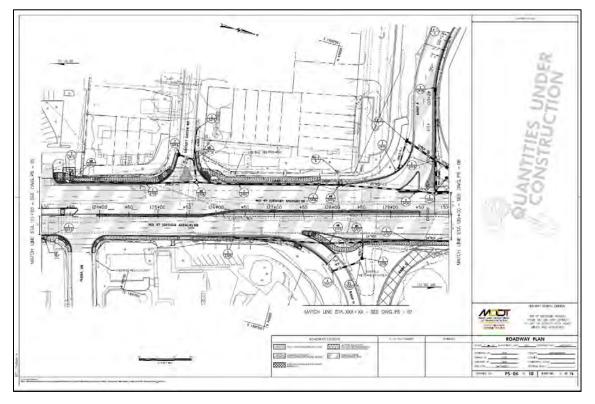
Plan View – Georgia Avenue between Flora Lane and I-495 Inner Loop Signal
